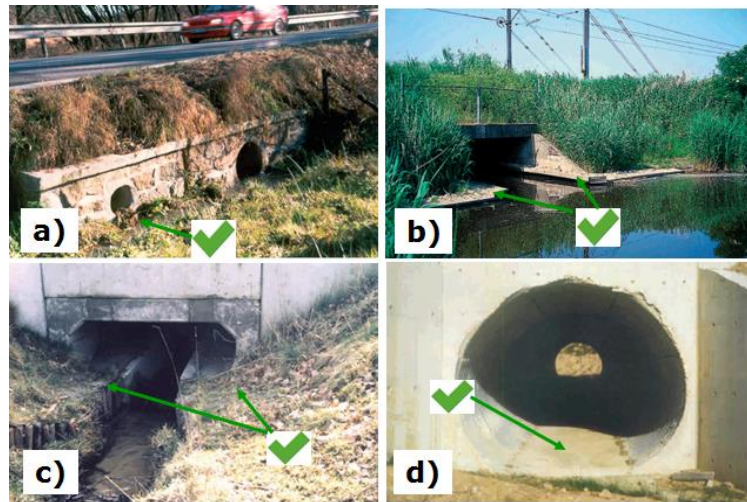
Examples of good culvert design to aid the passage of small mammals: a) a double culvert with one raised above the water level to allow for the passage of otters, who prefer dry crossings; b) retrofitted wooden walkways in a culvert in the Netherlands that are well connected to the dry embankment; c) prefabricated concrete culverts with integrated ledges in the Netherlands and d) example of a stormwater culvert in Spain made of corrugated steel where the ridges along the bottom section have been filled in with concrete afterwards to facilitate the passage of insects and small animals.
